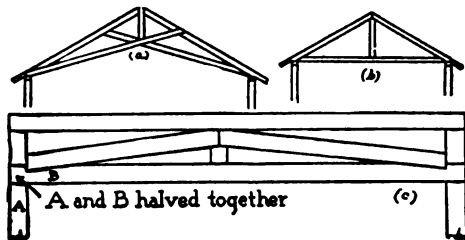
Simple roof framing for machine sheds (a and b) the latter providing extra storage space; and (c) one style of trussed lintel for a wide shed door.
